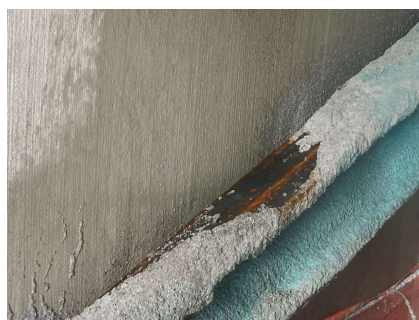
Fireproofing washed away as water ran down the inside of a precast wall panel.
